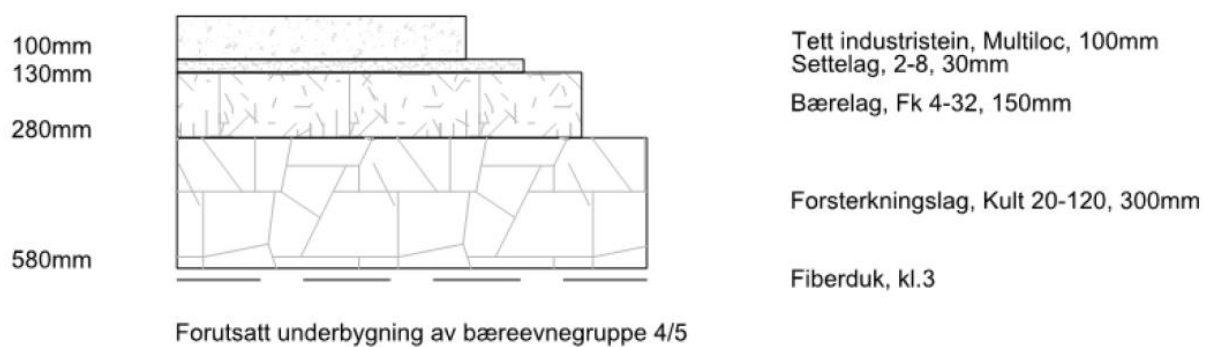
Design of test area 3 (Møller-Pedersen, 2015)
